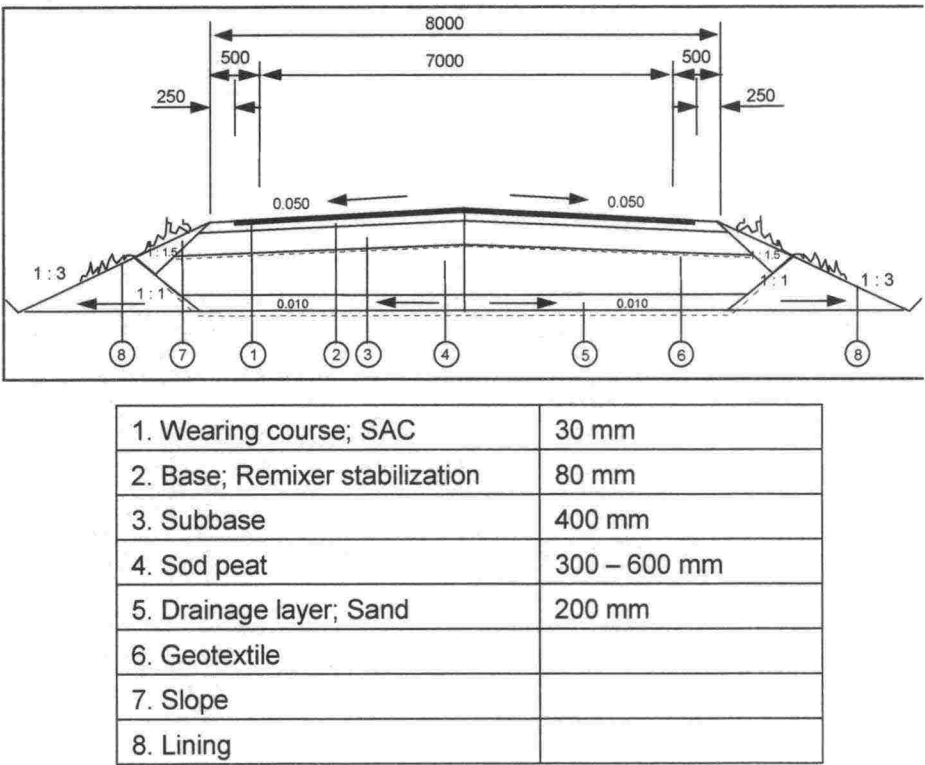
Sod peat structure of the Ranua test construction site, cross section.
